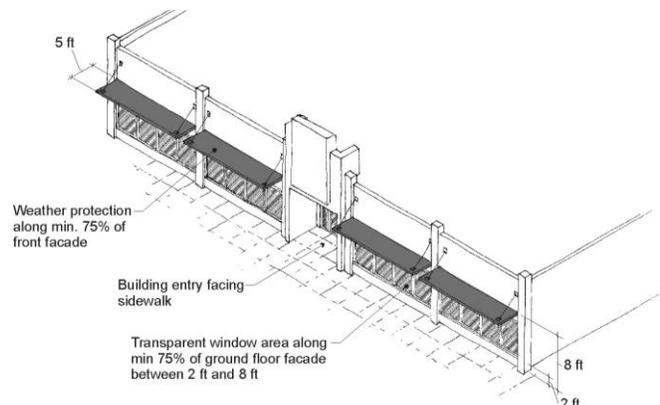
B.30.100a. Pedestrian-oriented façade requirements.
